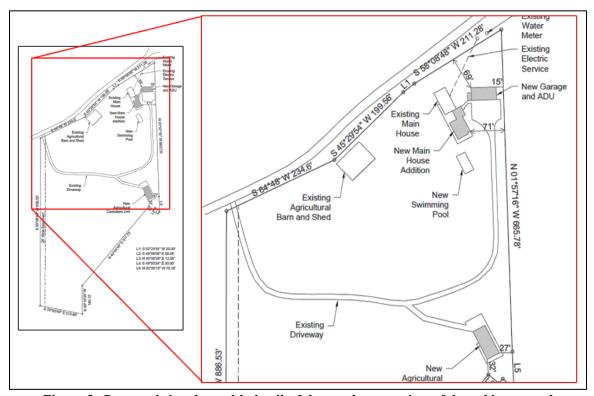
Proposed site plan, with detail of the northern portion of the subject parcel.
